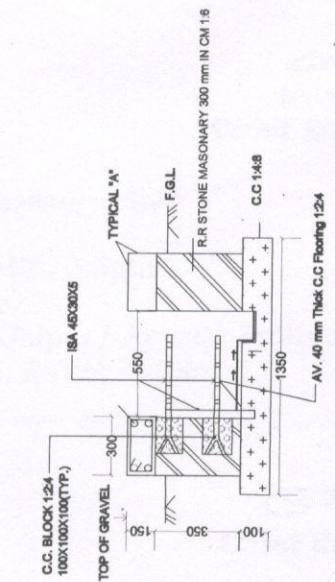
DETAILS OF CABLE TRENCHES FOR 132/220 KV GSS (SWITH YARD)
